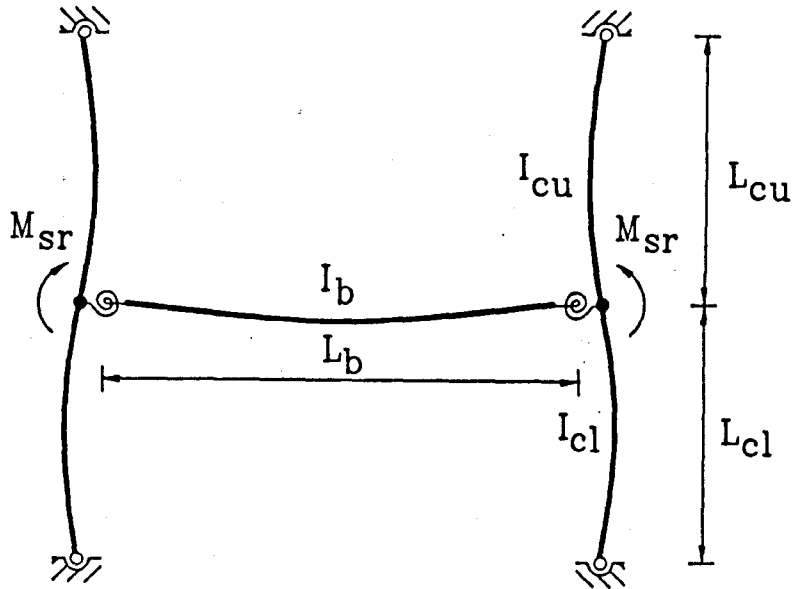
Beam and column subframe with semi-rigid beam to column connections.
